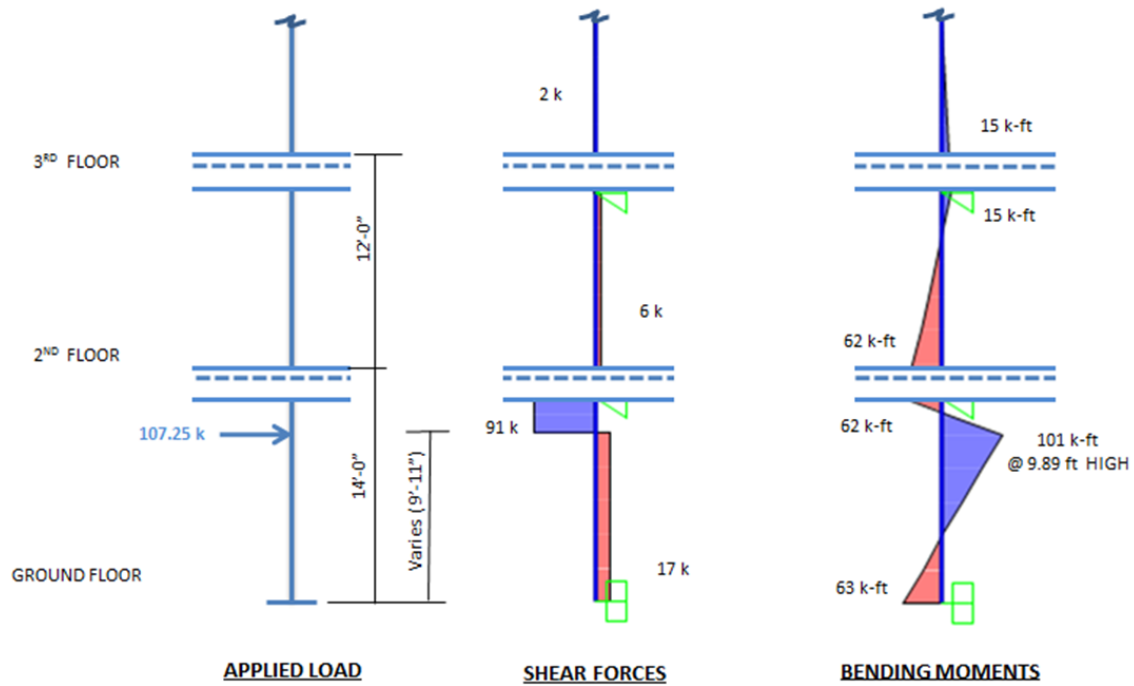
Impact load applied at "d" away from the end of column on the ground floor
